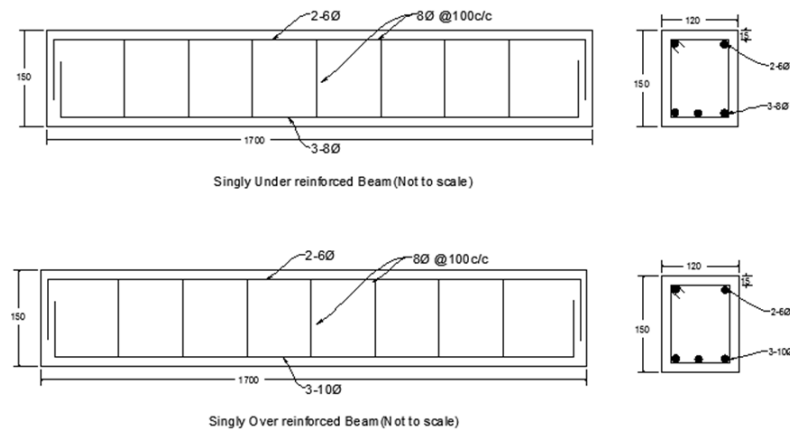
Cross Section of Beam (a) Singly Under Reinforced (b) Singly Over Reinforced
